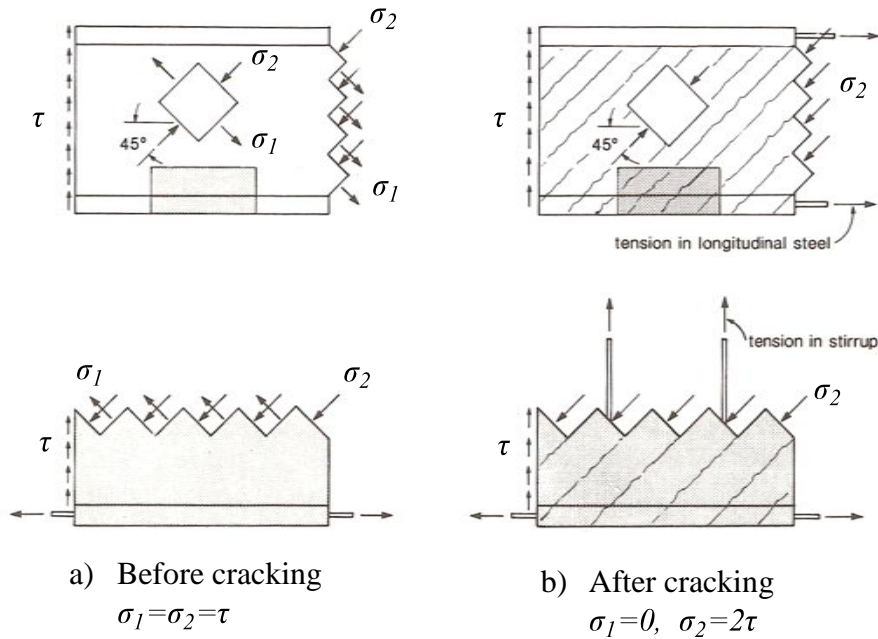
Shear resistance of a reinforced concrete beam a) before and b) after cracking.  $\sigma_1$  denotes tensile principal stress,  $\sigma_2$  denotes compressive principal stress and  $\tau$  denotes shear stress. (Collins & Mitchell, 1991)
